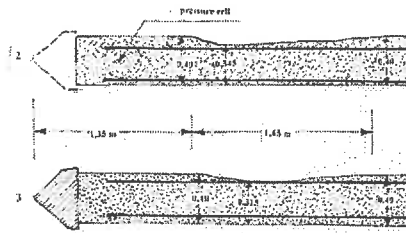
Shape and dimensions of 2 fully reinforced piles, made and extracted in Amsterdam.
